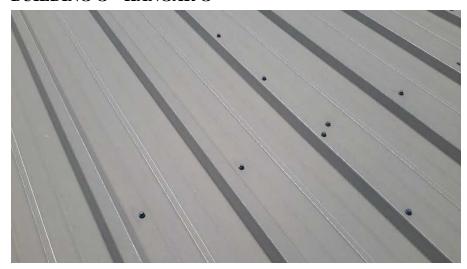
Hangar G - roof panel paint coat is getting worn, screws working loose
